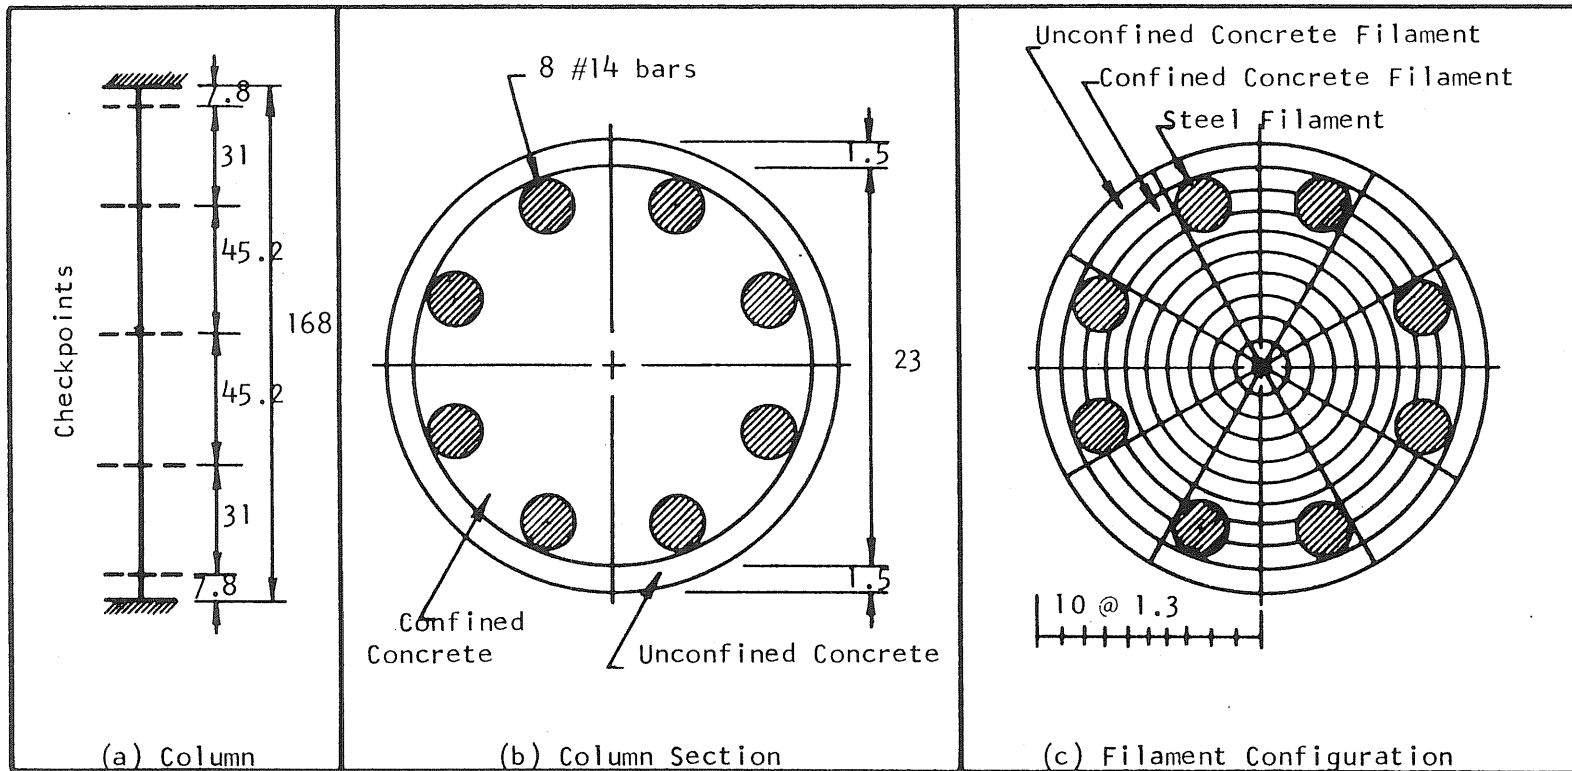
Column Model and Filament Configuration (Units Inches)
